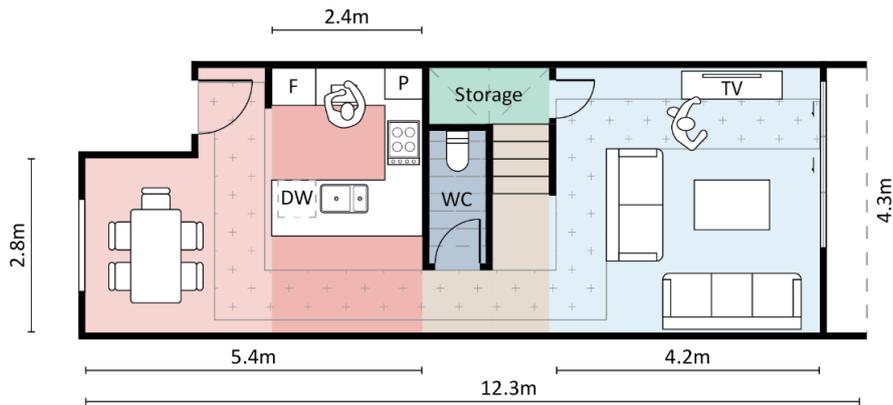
Example of an open floor plan where the kitchen, dining space and lounge are in one space
